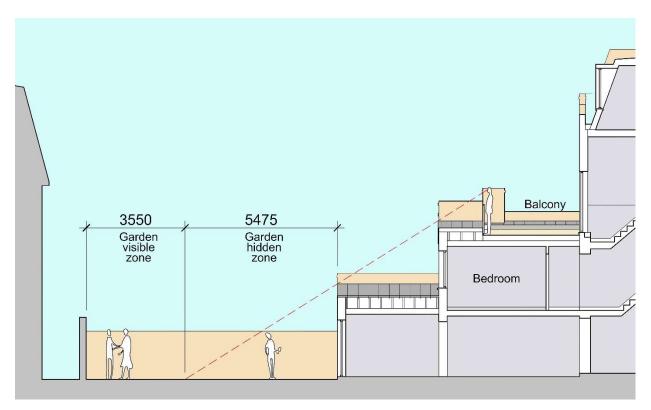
North-south section through ground floor garden. This section shows the limited view from the balcony area, restricted to the rear part of the garden only
